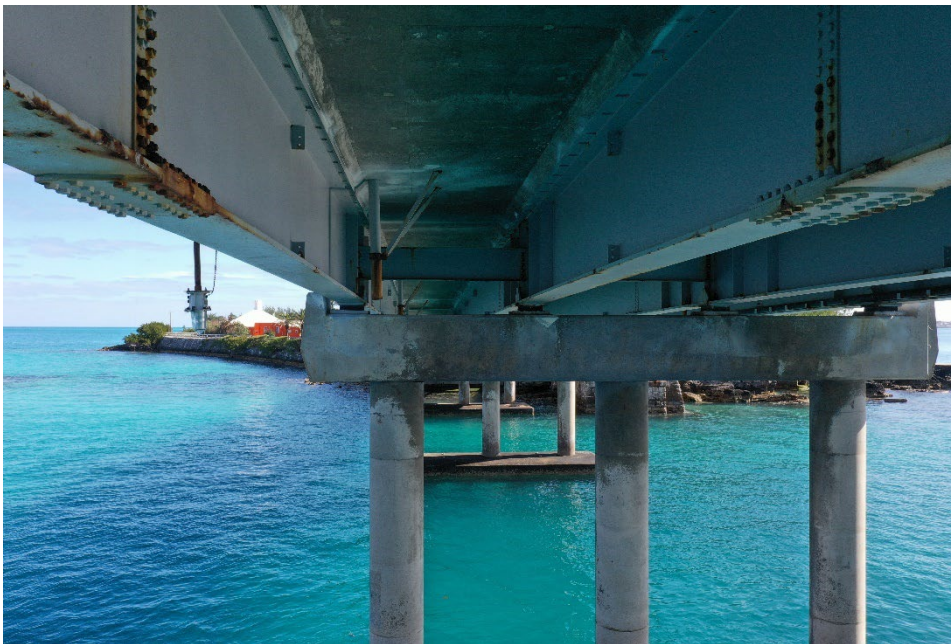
Bearings 15 and 16 showing cracking of the concrete plinths
